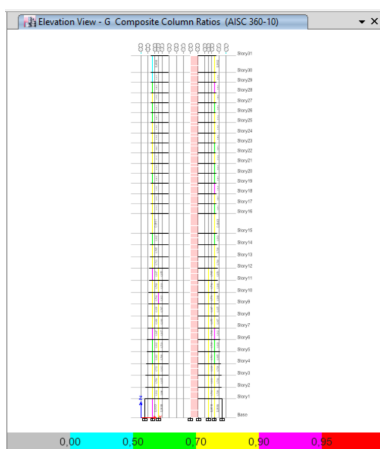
utilization degree for composite columns at elevation G due to ULS wind loads
